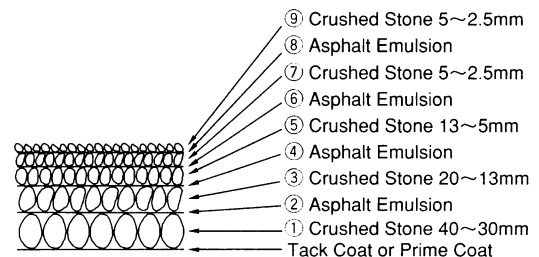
Standard Cross Section of Penetration Macadam (Surface Thickness 4cm)²⁾
